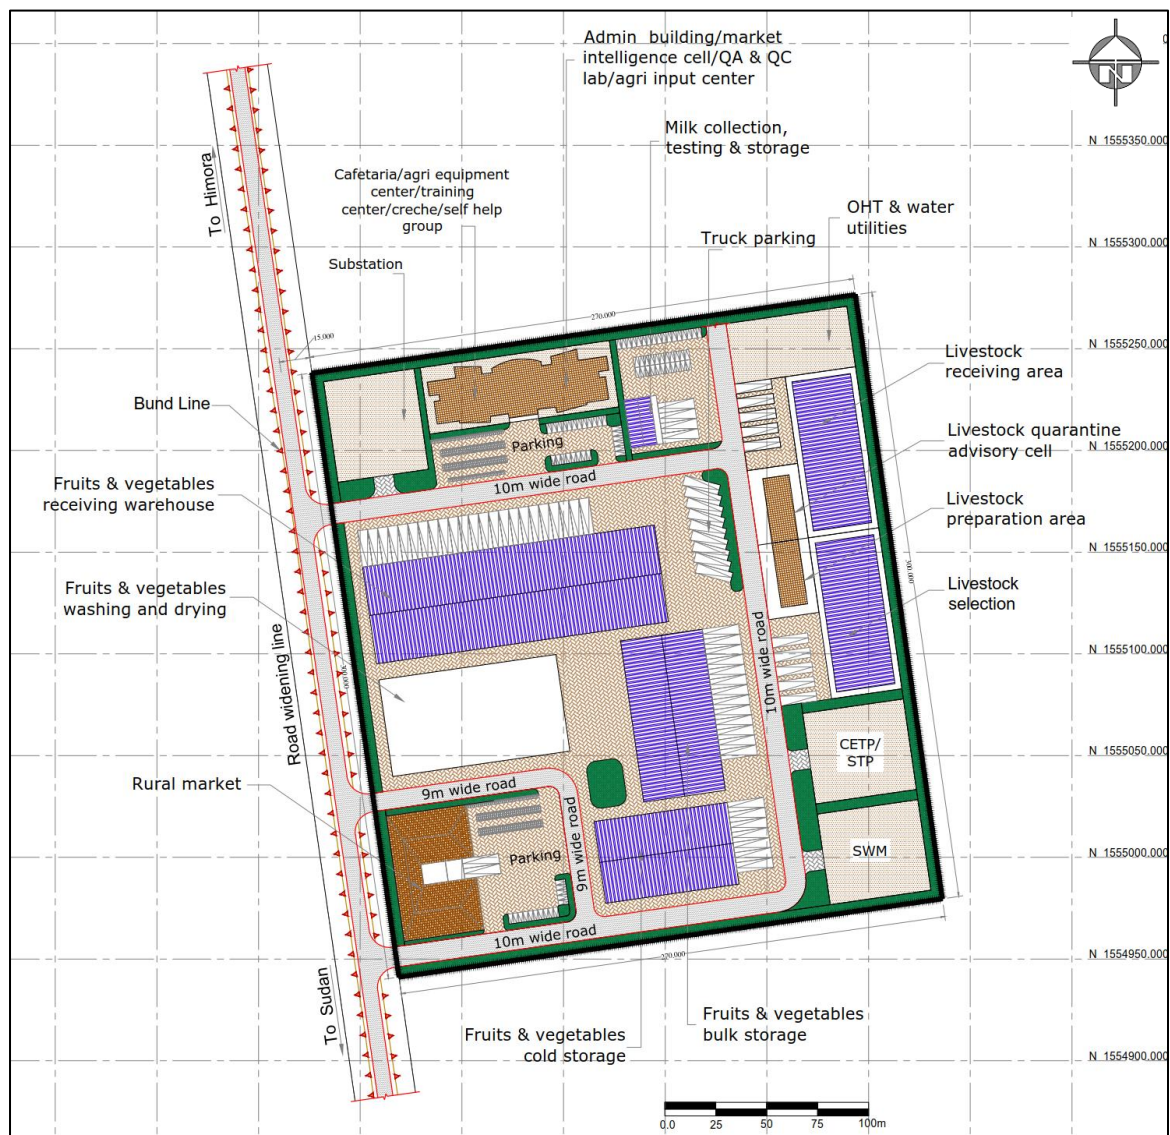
Master Plan of the Mai Kadra RTC (adapted from MACE Master Plan Drawing)
